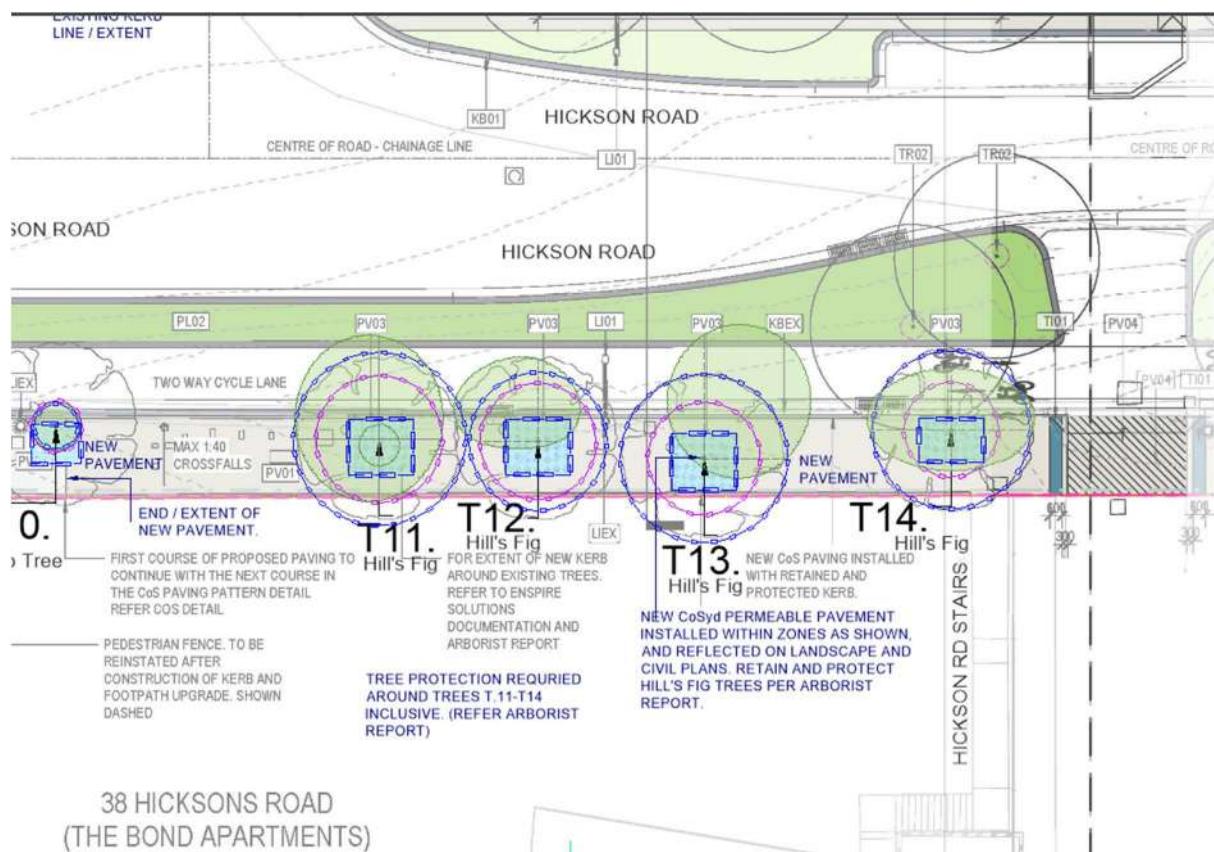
A portion of the proposal plan with the Arborist data over the proposed works to show and compare the new proposed streetscape arrangement.
